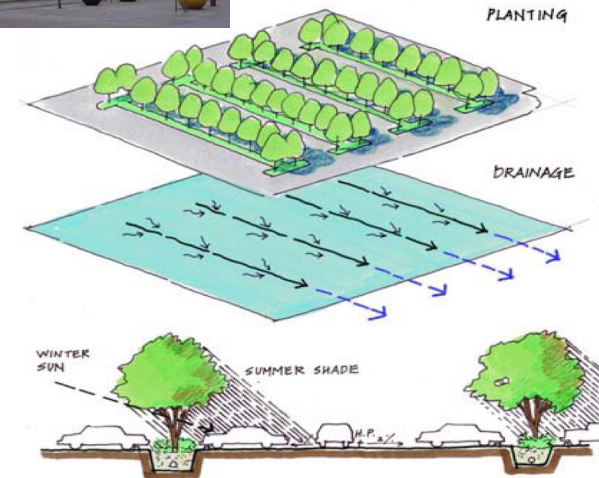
(Source Wallace, Roberts and Todd, Plan for Peoria, Illinois)
